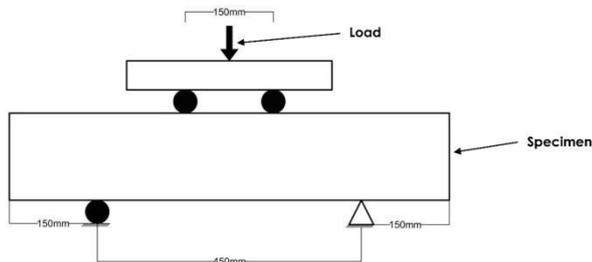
Details and dimensions of Beam 3 for steel and GFRP.
